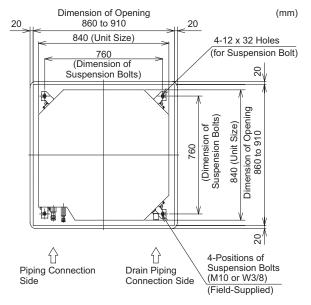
Opening of False Ceiling and Suspension Bolts
